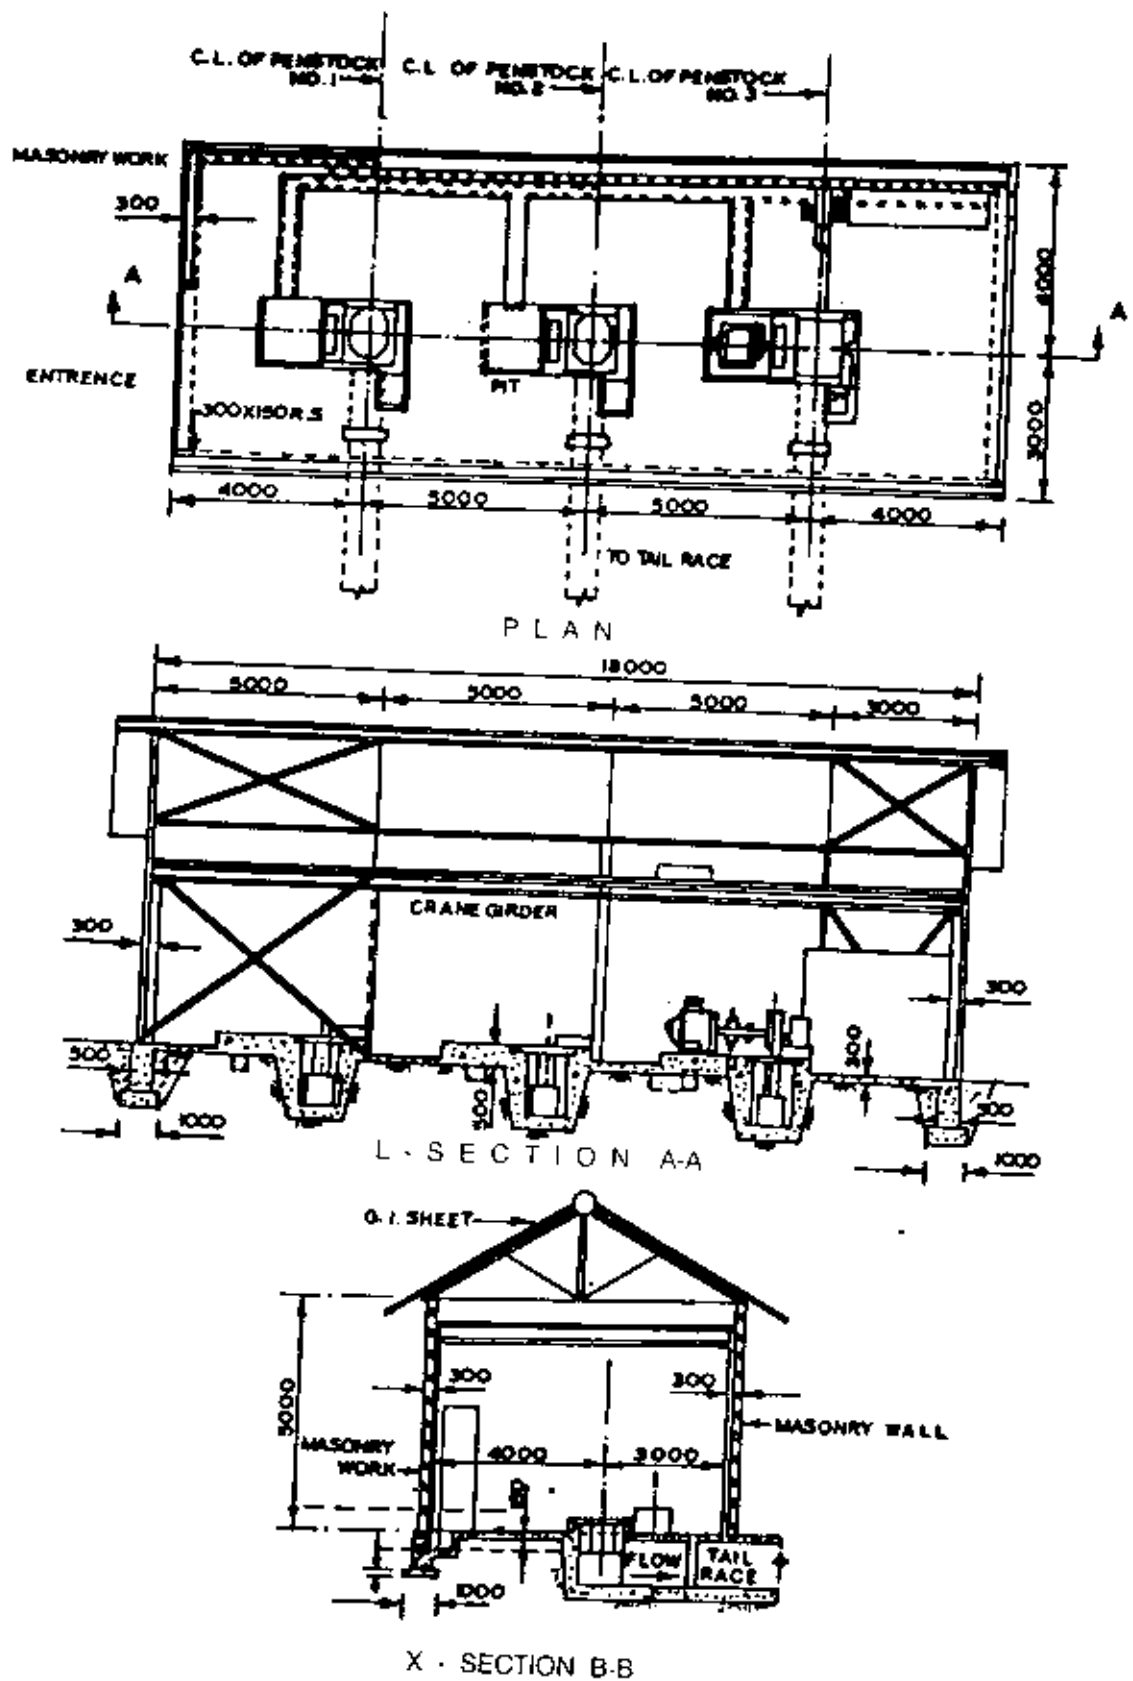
TYPICAL LAYOUT OF POWER HOUSE FOR MEDIUM AND HIGH HEAD PROJECTS
